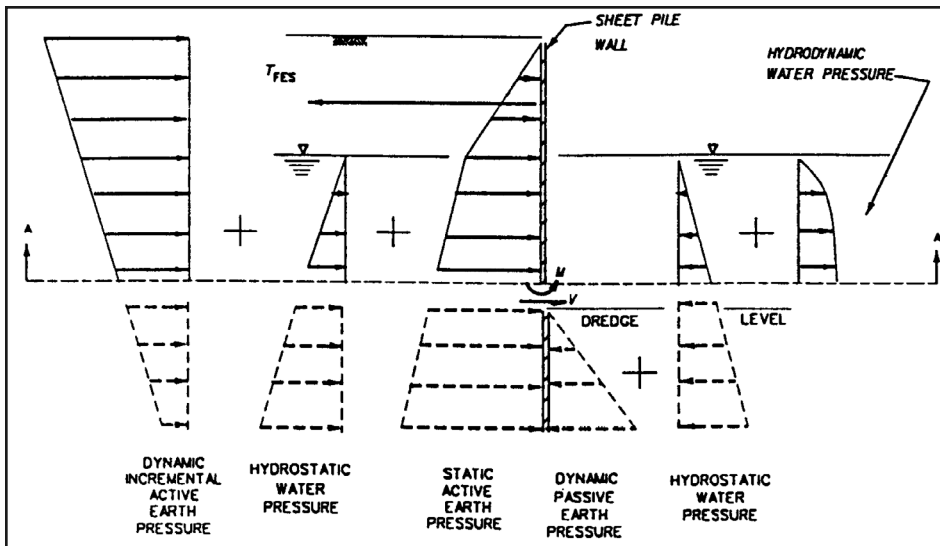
Static and Dynamic Horizontal Pressure Components and Anchor Force Settings on a Sheet Pile Wall.
